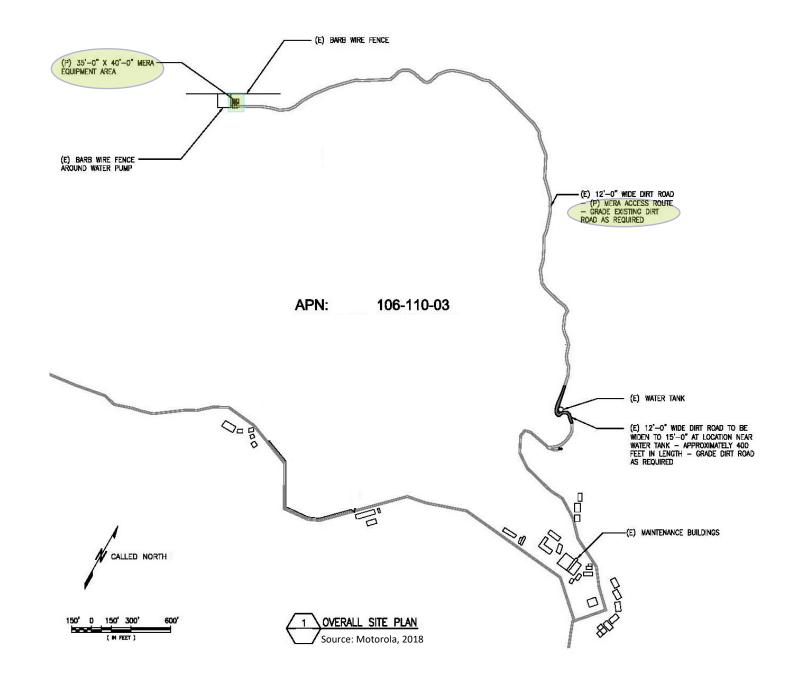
Site 21 - Coyote Peak Overall Site Plan
